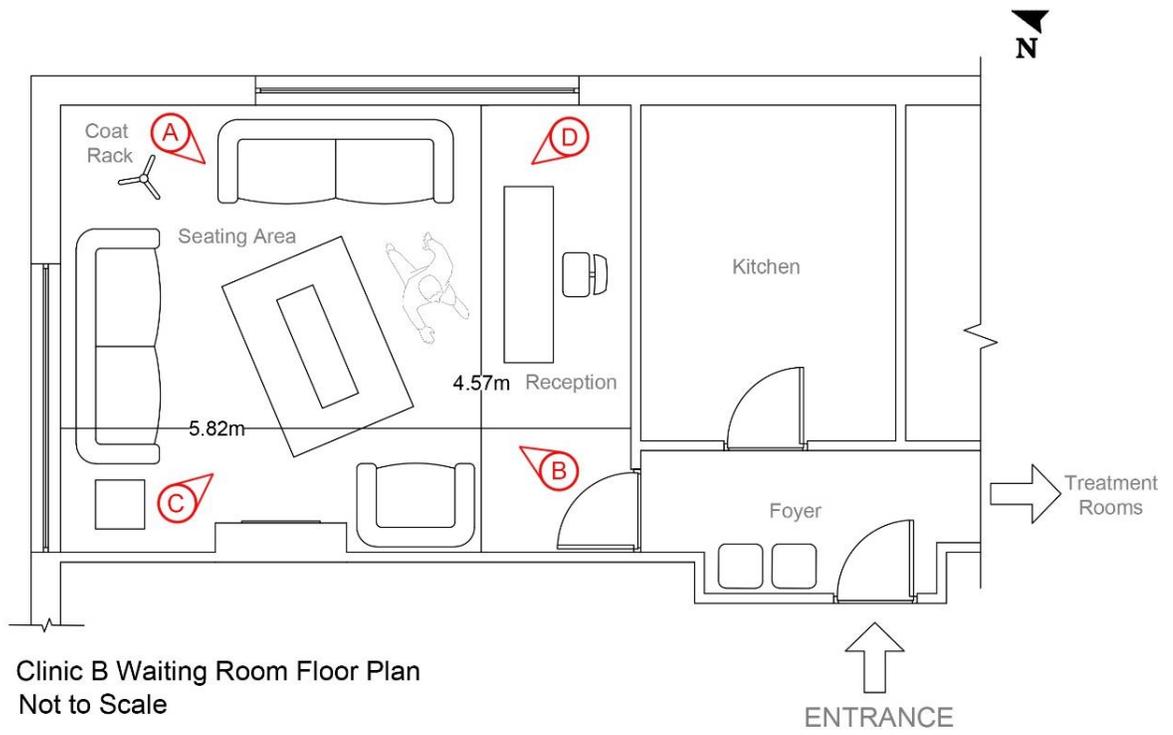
Floor plan of Clinic B (drawn by the author, 2022).
